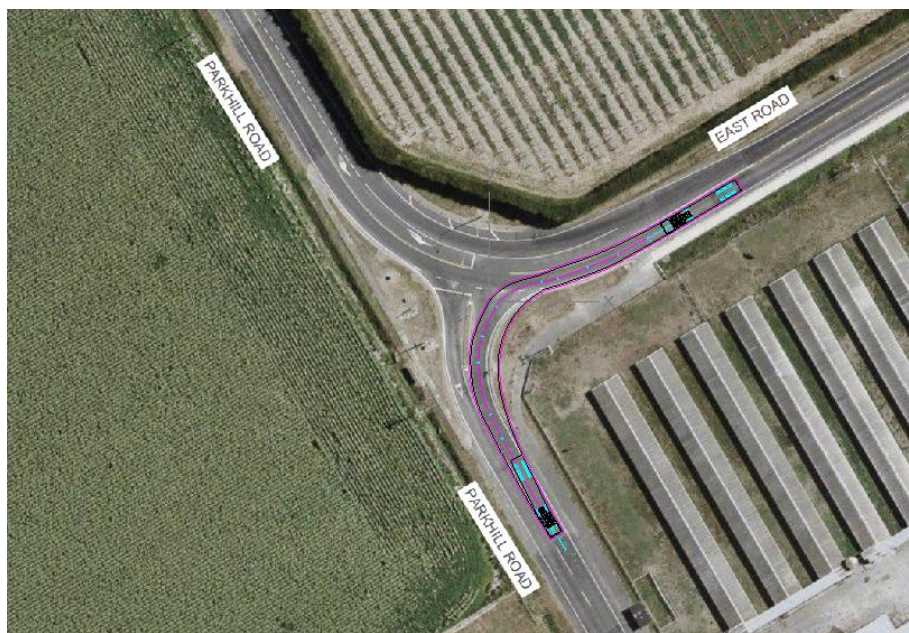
Vehicle tracking – Parkhill/East Road intersection – Left-turn onto Parkhill Road (South)
